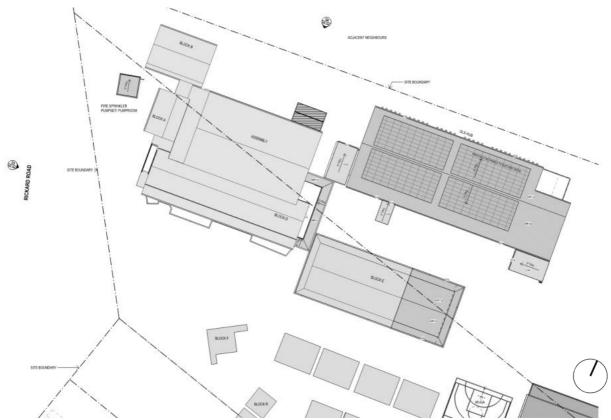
Proposed roof plan – northwestern (Source: Pedavoli Architects)
